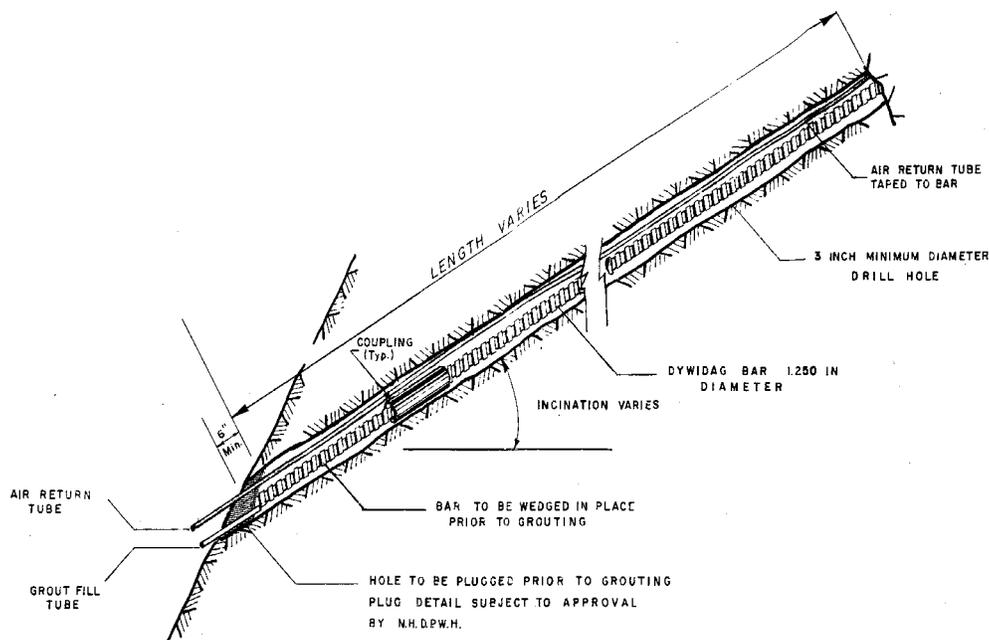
Detail of Rock Tendon (Haley and Aldrich, 1973)
